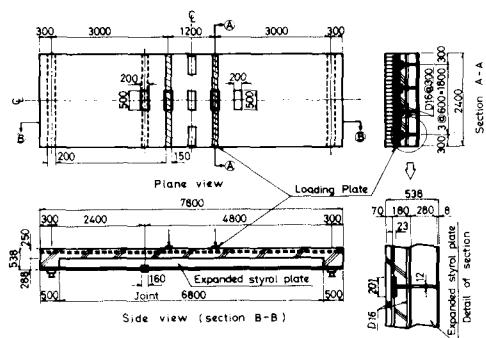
Dimensions and loading arrangement on hollow composite slab
